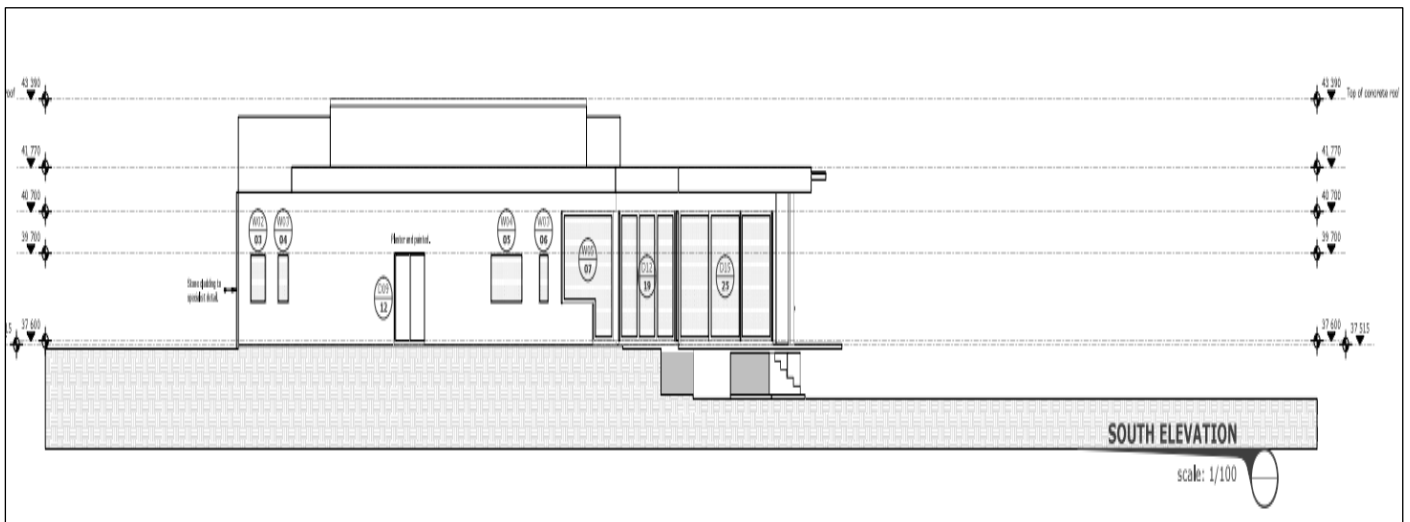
South elevation of the proposed entertainment facility (TMBA, 2018)
